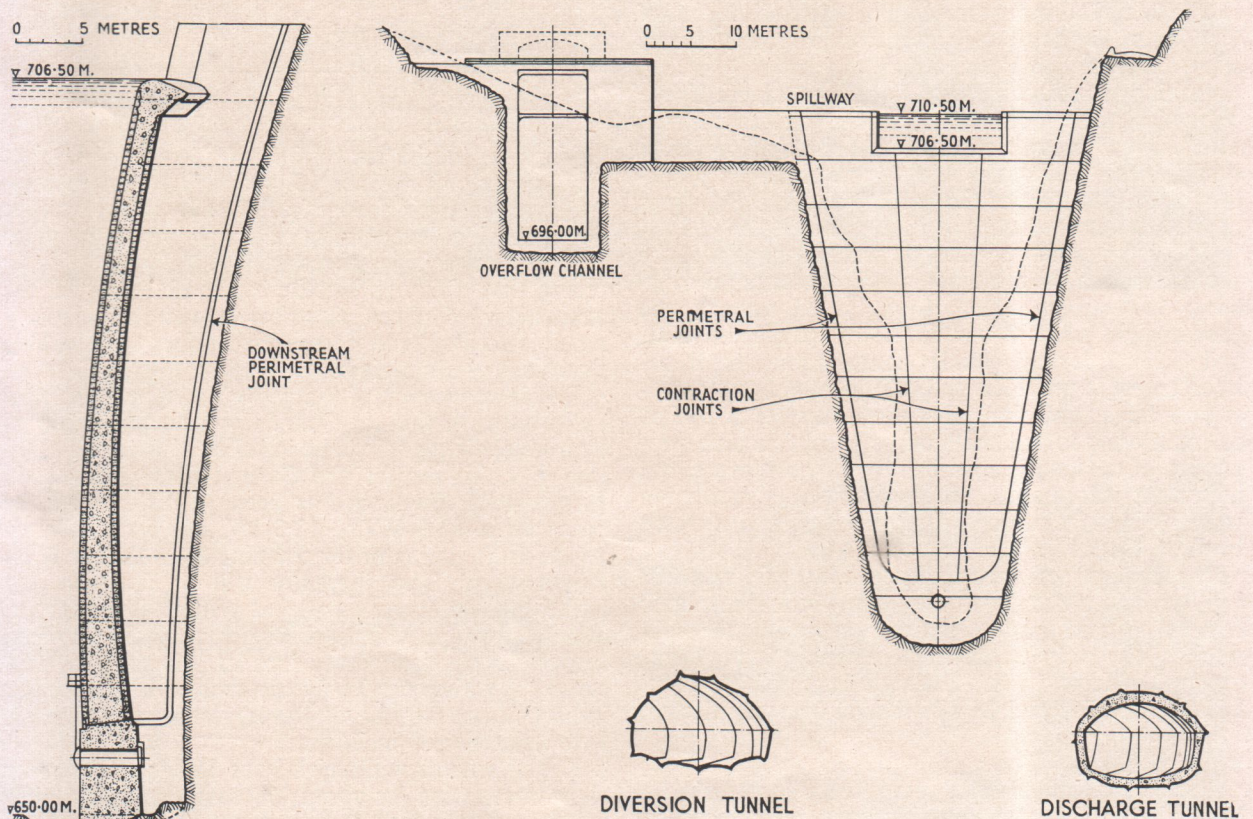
Valle di Cadore dam: section along middle fibre, and cross-section showing arrangement of facing blocks
